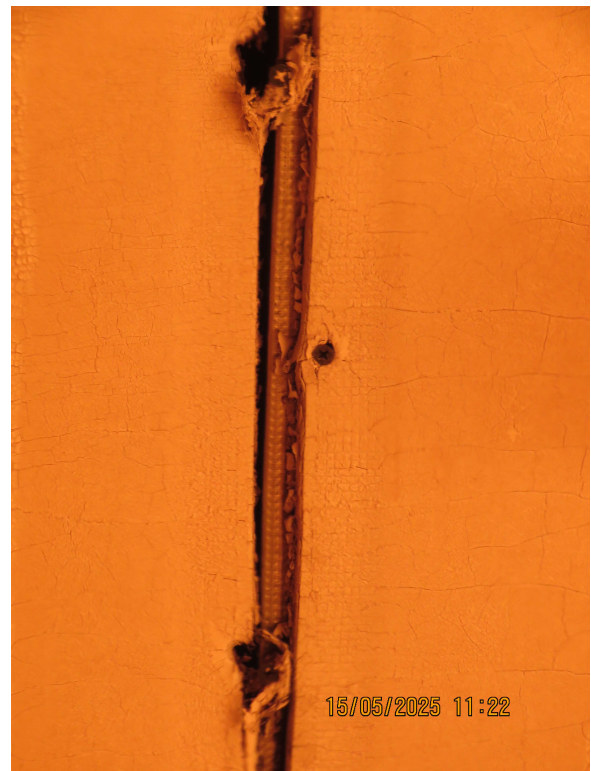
Exposed surface with joint opening up 22 minutes after the start of the test.
